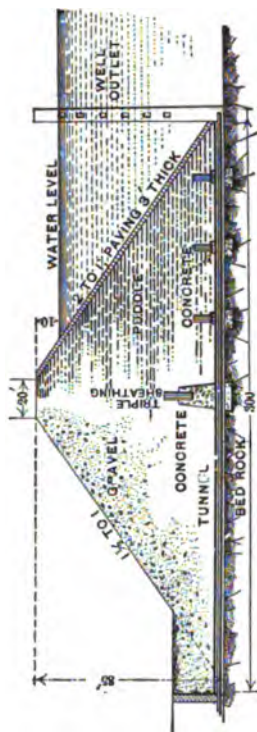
Cross-section of Earth Dam, Santa Fé, showing Masonry Cross-Trenches.
